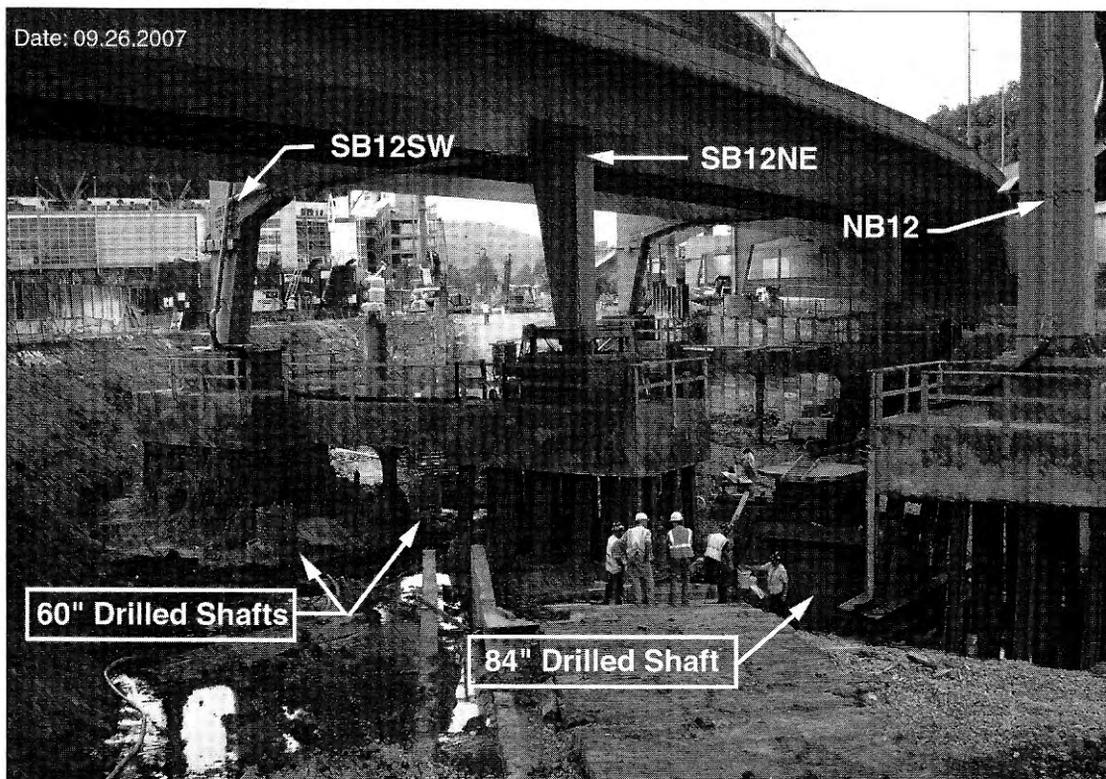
Bent 12 underpinning with foundation piles exposed.
